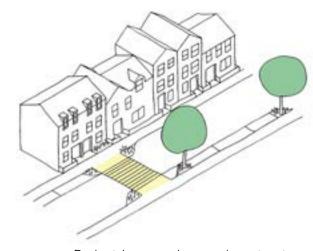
Pedestrian crossings and on street parking reduce traffic speeds
